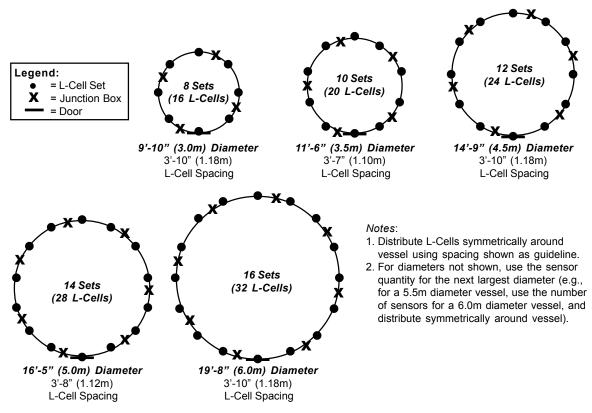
Plan View — L-Cell and Junction Box Locations (Aluminum)
